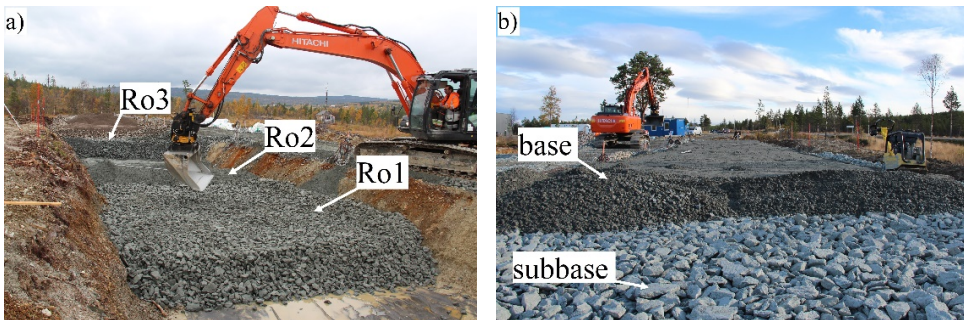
Structural layers in road section Ro1–Ro3: a) frost protection layer; b) base and subbase layer
